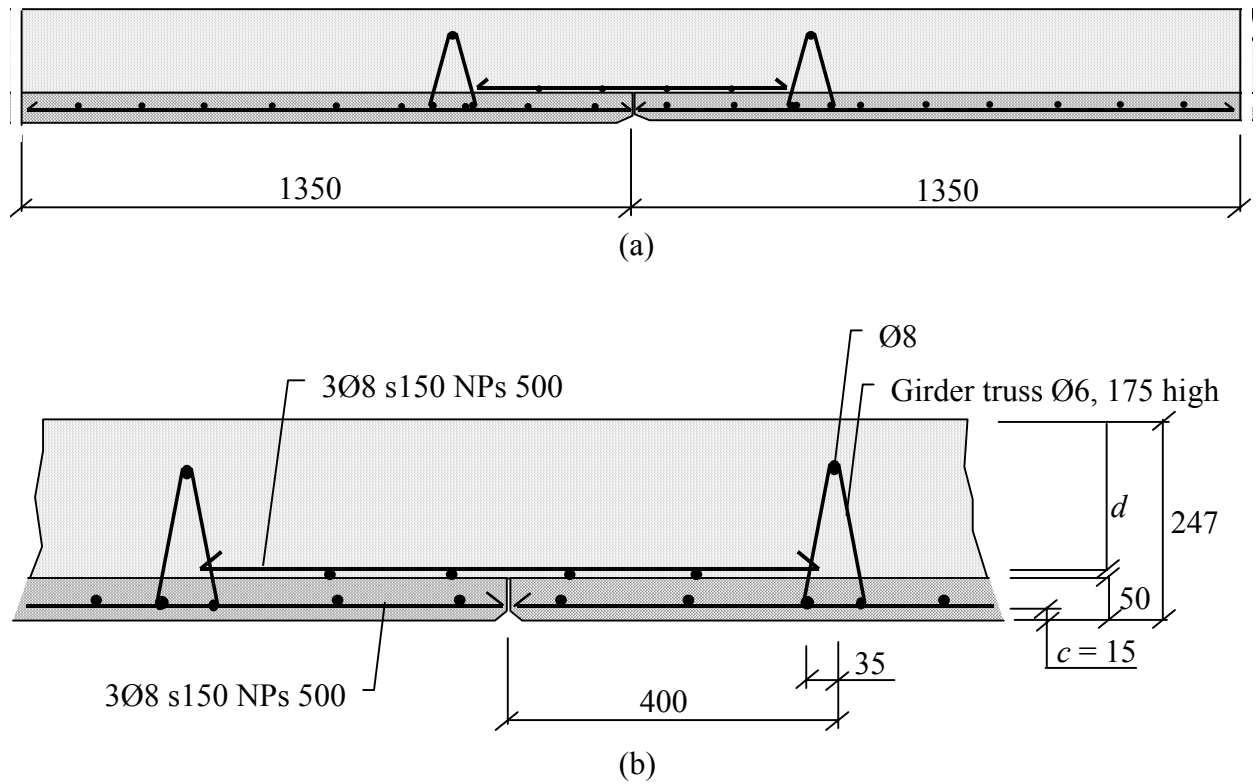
Geometry of the lattice girder structure, a) Overview, and b) Detail at the joint.
